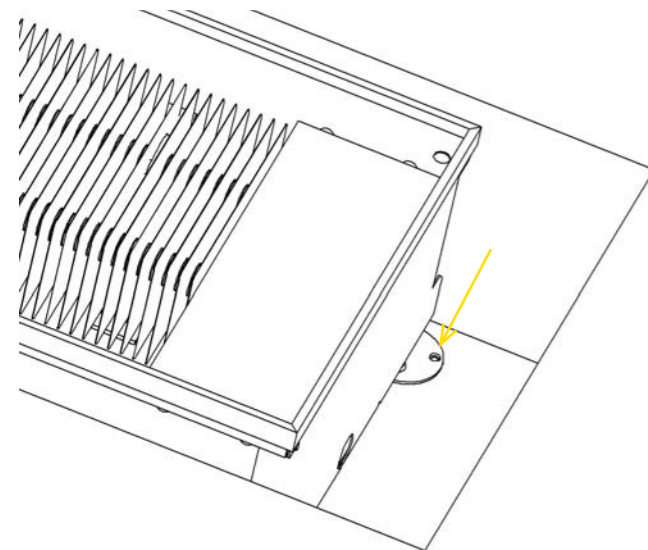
Place the convector in the installation hole and mark feet mounting holes.
